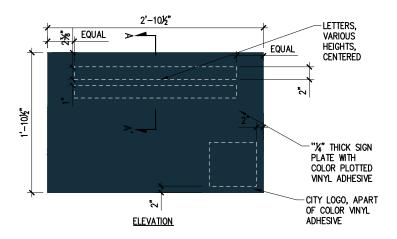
City Facility Building Facade (Large & Small) Sign Standard Details
